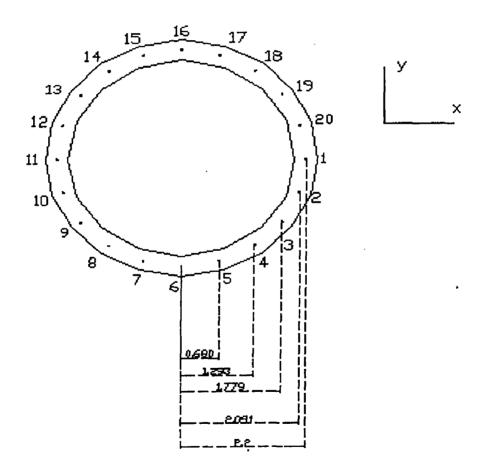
Plan of pedestal top with nodes that are to be loaded
